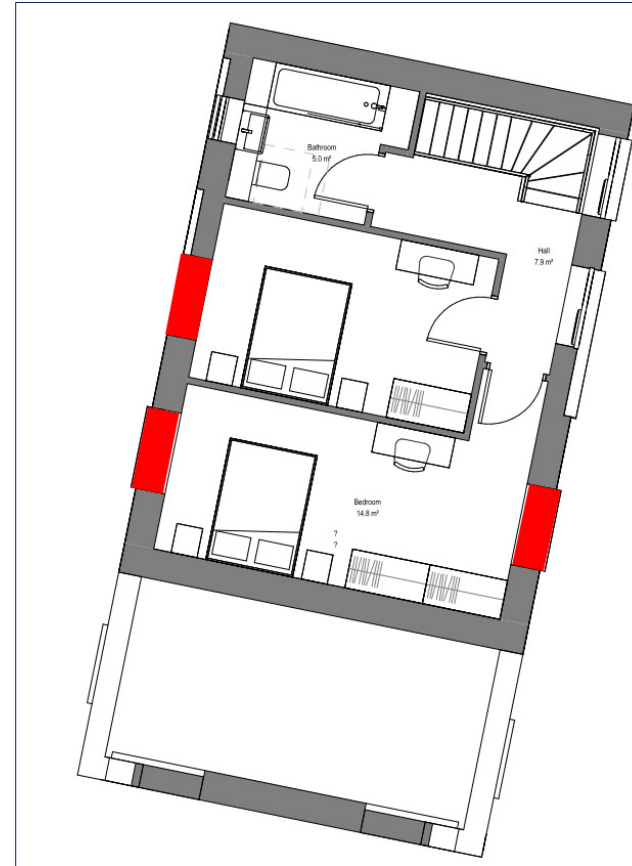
Recommended façade strategy – Townhouses, 2F
